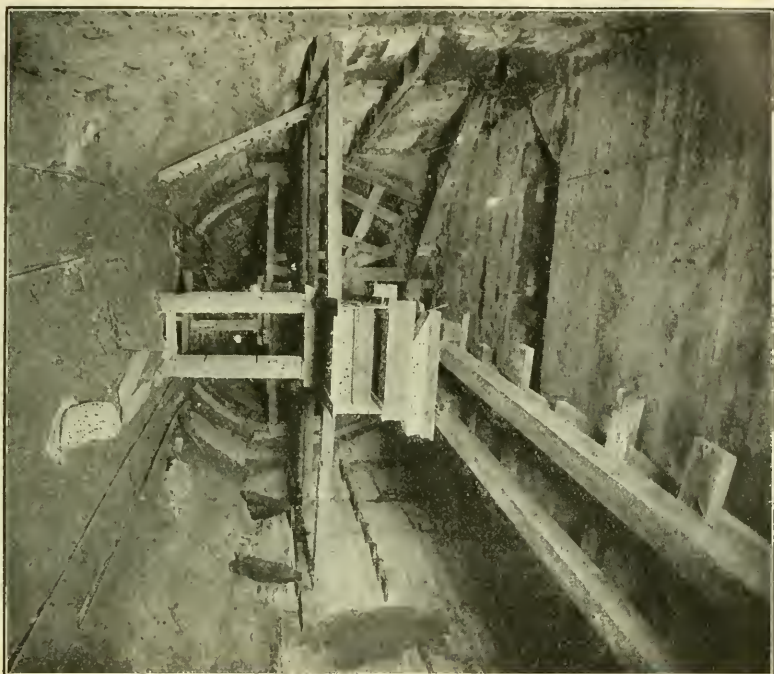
VIEW UNDER TRINITY VESTRY BUILDING WITH THE
